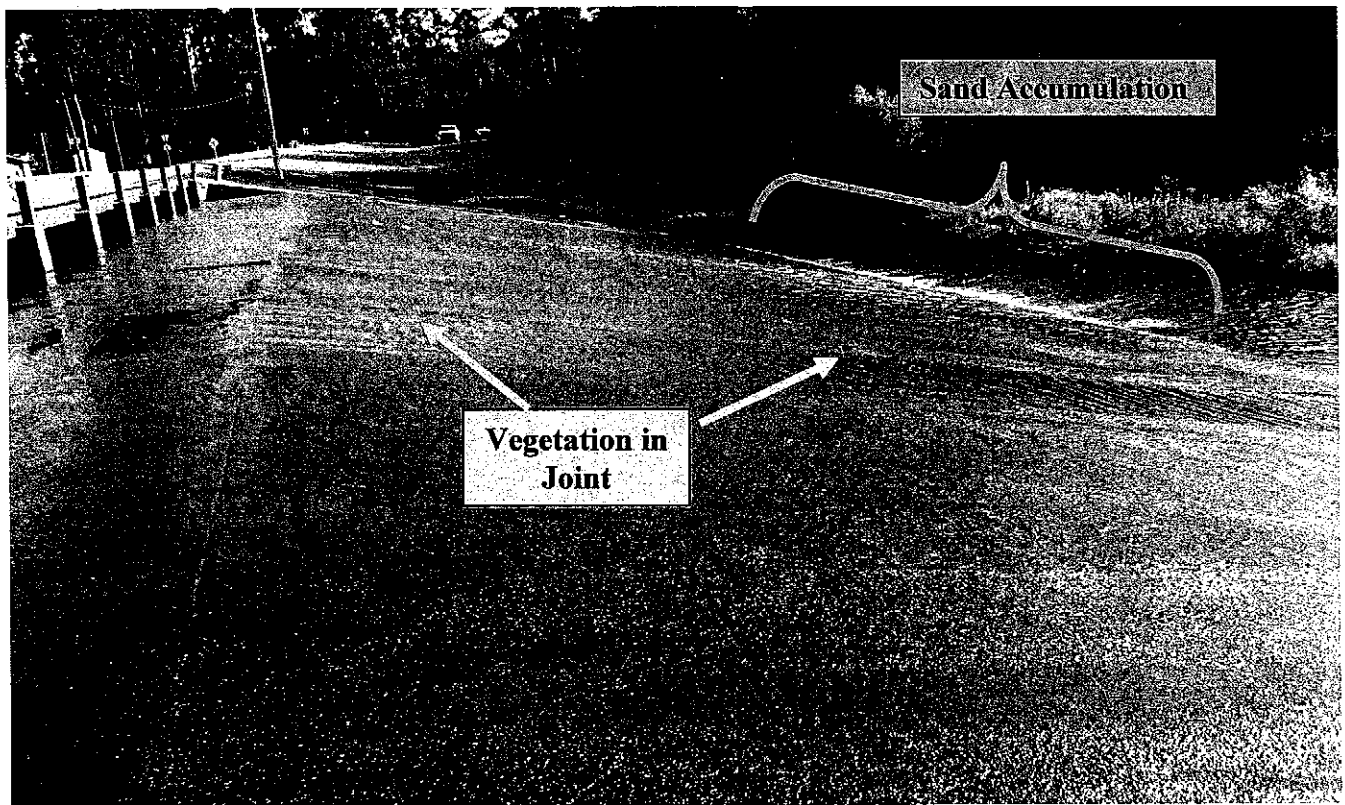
Principal spillway. View is looking north across the downstream side of the principal spillway. The spillway was engaged. Vegetation was growing in the joint where noted. Note the areas of accumulated sand along the downstream toe.
